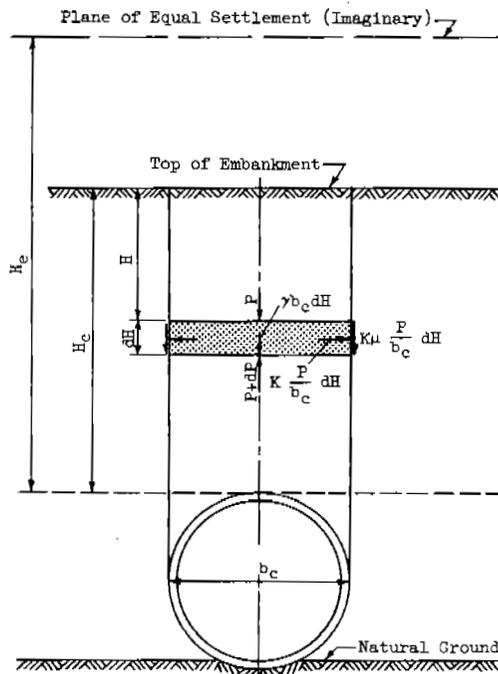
Loads on a horizontal element in the interior prism for the complete condition
